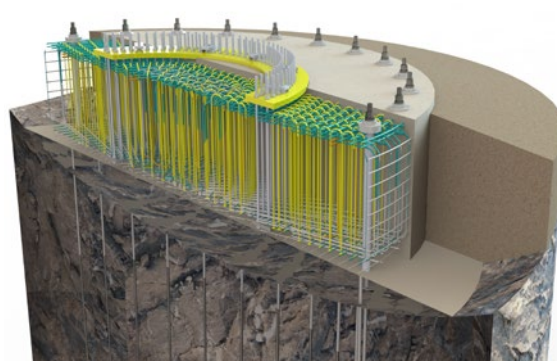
THE SECTION VIEW OF REINFORCEMENT CAGE OF WIND TURBINE'S FOUNDATION
